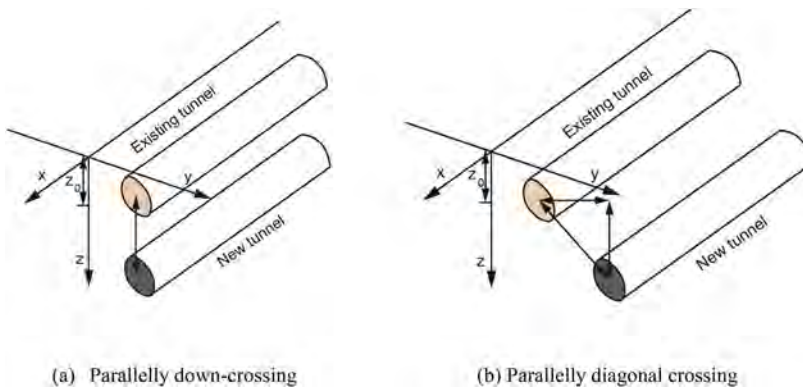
Relative position between new tunnel and existing tunnel (Liang et al., 2016). (a) Parallely down-crossing (b) Parallely diagonal crossing.
